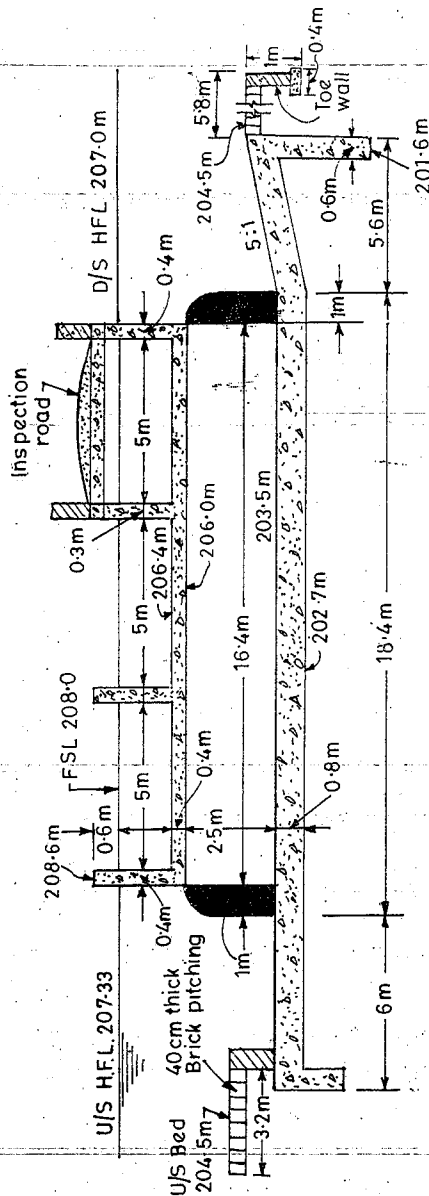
Section of Siphon Aqueduct in Example 14.2.
